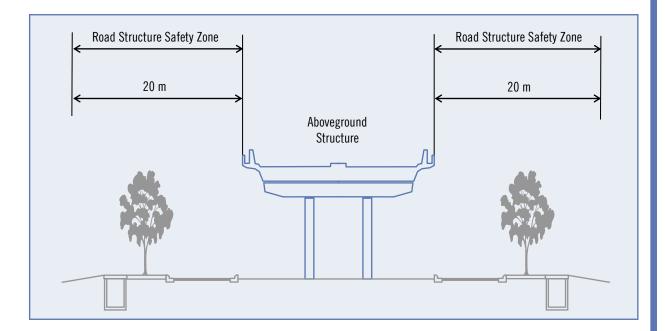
Road Structure Safety Zone for Structures Above Ground Structures
